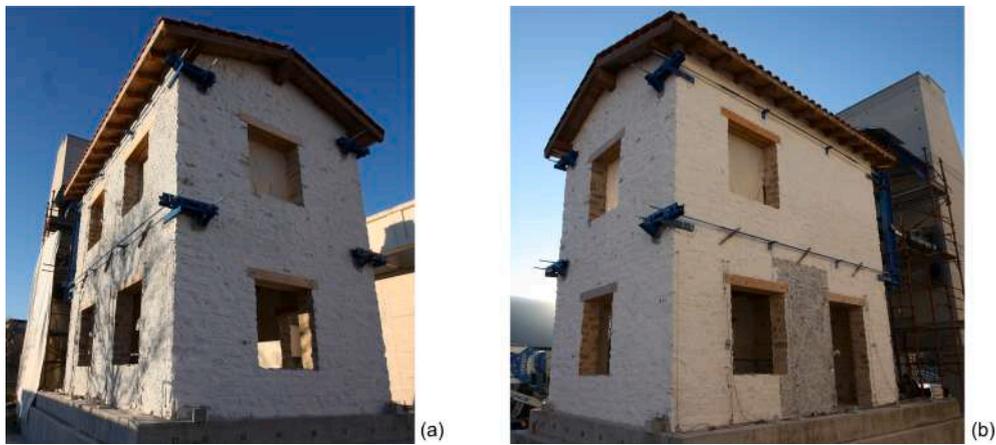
Views of the building from outside: (a) East and North walls; (b) North and West walls.
